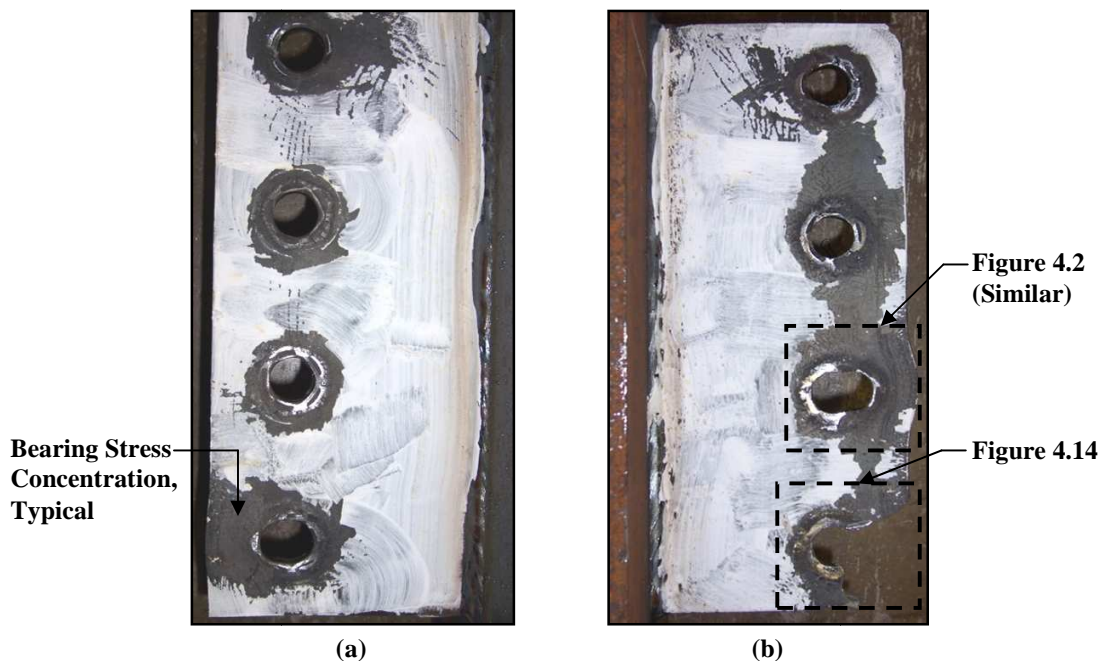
Test 4ST1 Connection Specimen Post-Test Condition.
